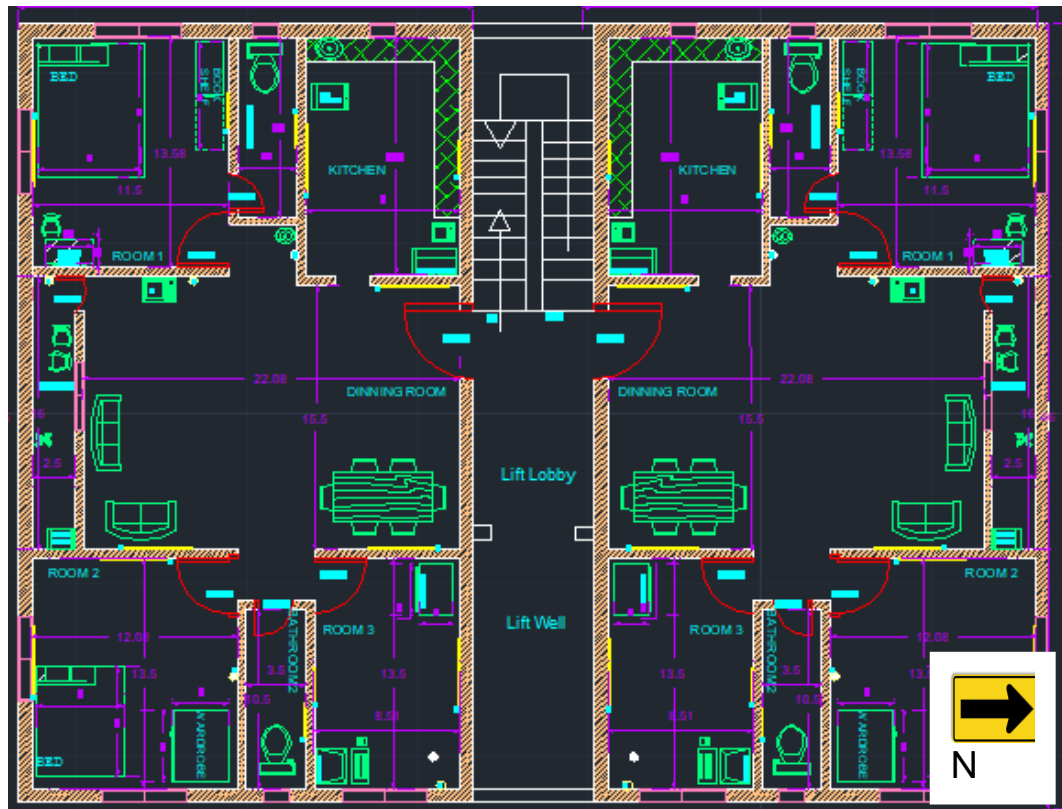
Plan View of the each flat (in the picture two flats plan view are shown)
